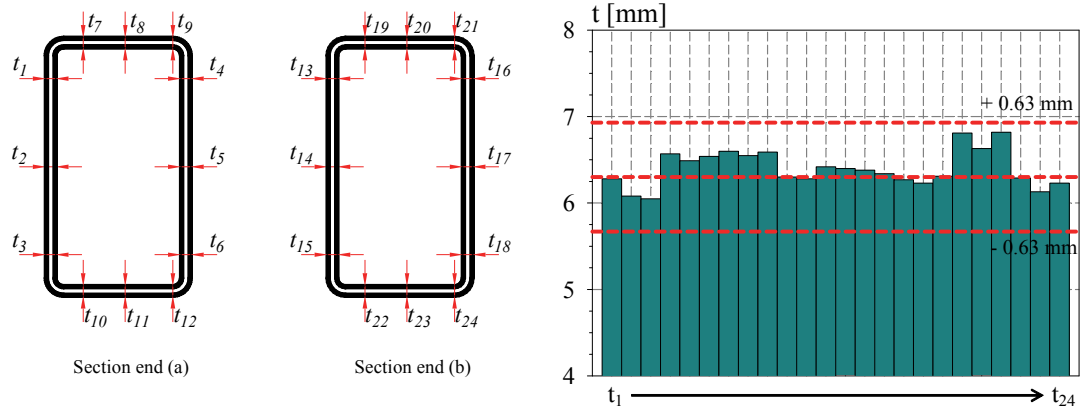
Example of detailed cross-section measurement for RHS_220x120x6.3_SS_3P along with the Eurocode tolerances
